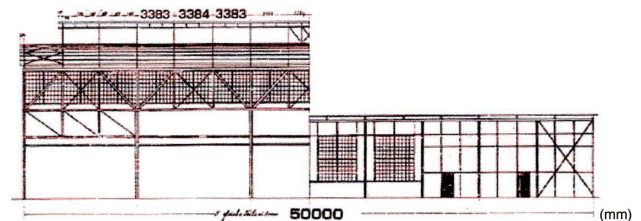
Framing elevation drawing of Repair Shop⁵⁾
